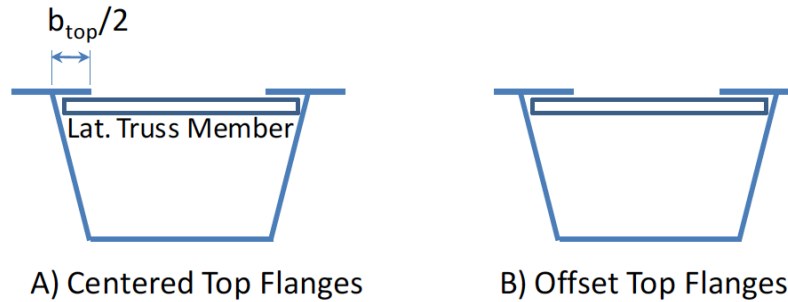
a) Top Flanges Centered to the Web, b) Top Flanges Offset Inside the Tub Girder
